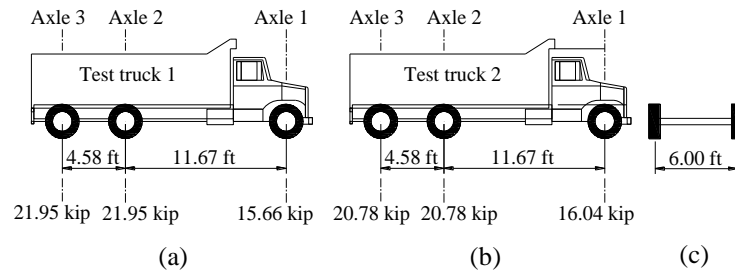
Load test trucks dimensions and axle weights: (a) test truck 1; (b) test truck 2; (c) front view showing axle width [1 ft = 0.3048 m, 1 kip = 4.4482 kN]
